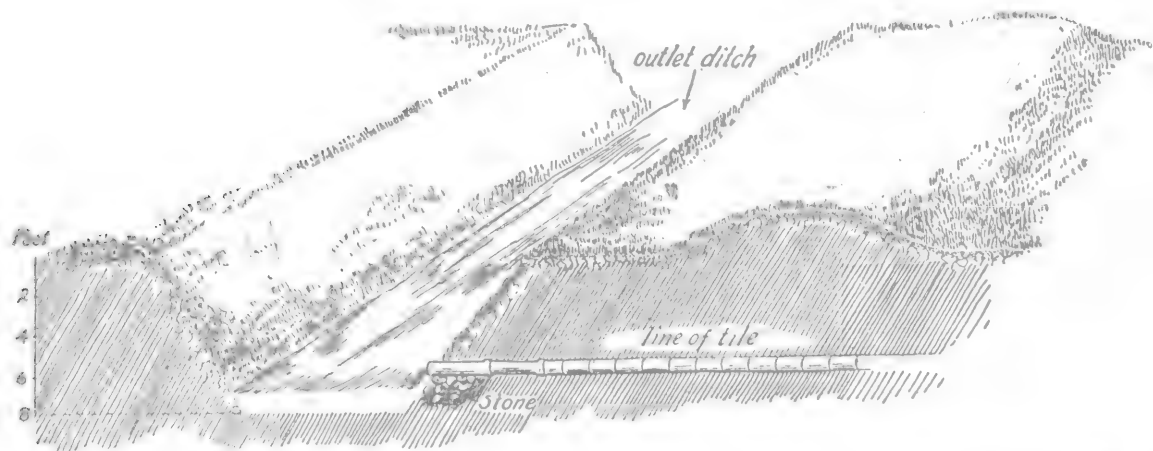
An open ditch should be deep enough to permit tile to empty into it. With few exceptions, an open ditch smaller than six feet deep, three feet wide at the bottom, and fifteen feet wide at the top, has no excuse for an existence. (Wisconsin Station.)
